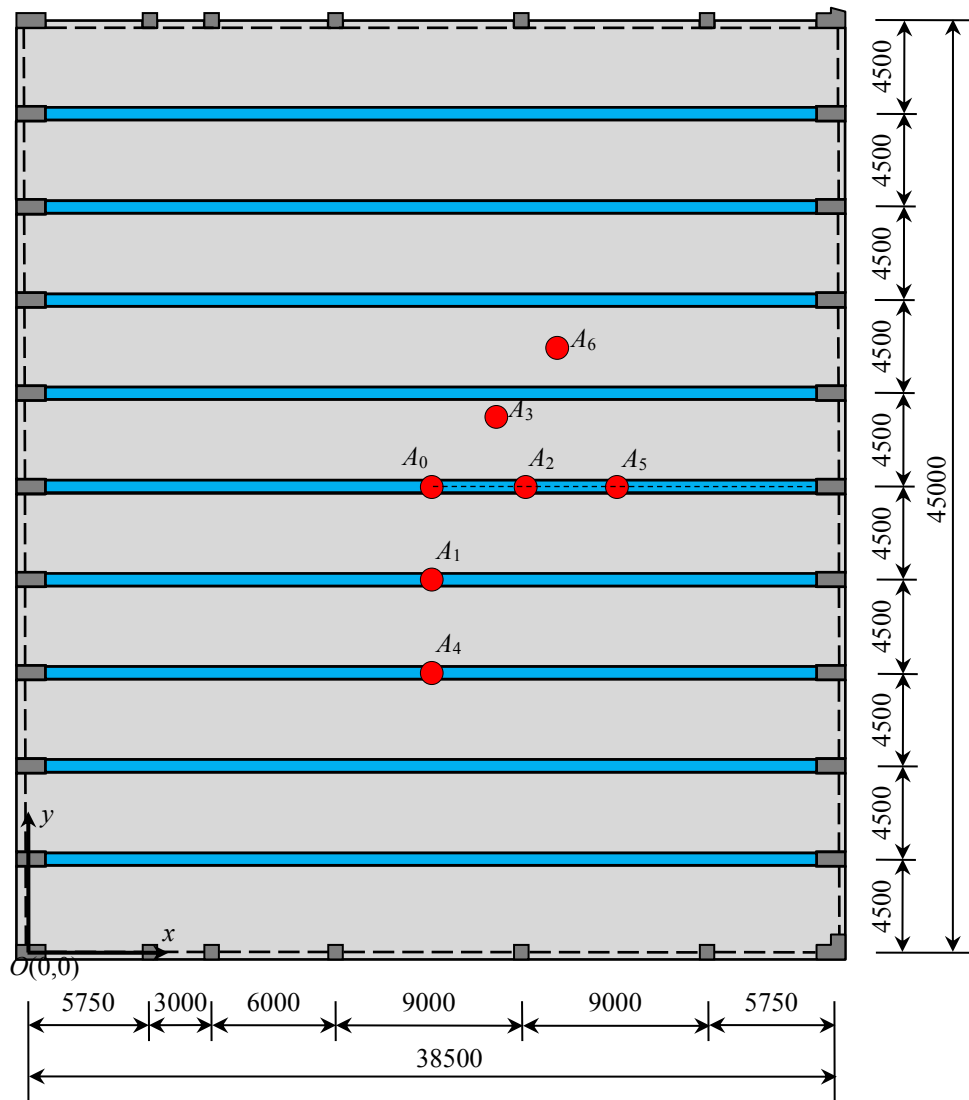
Outline of prestressed concrete floor #5 (all dimensions in mm)
